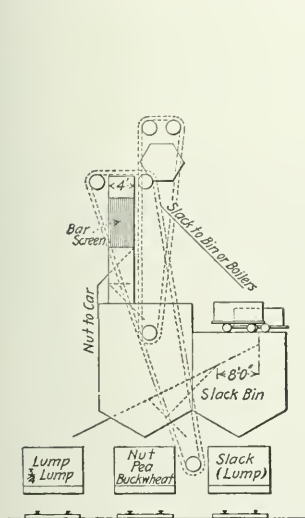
A FINE-COAL LOADING ARRANGEMENT
